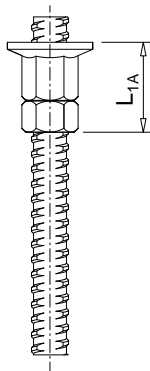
Length of end anchorage – Example with torqued anchor piece
